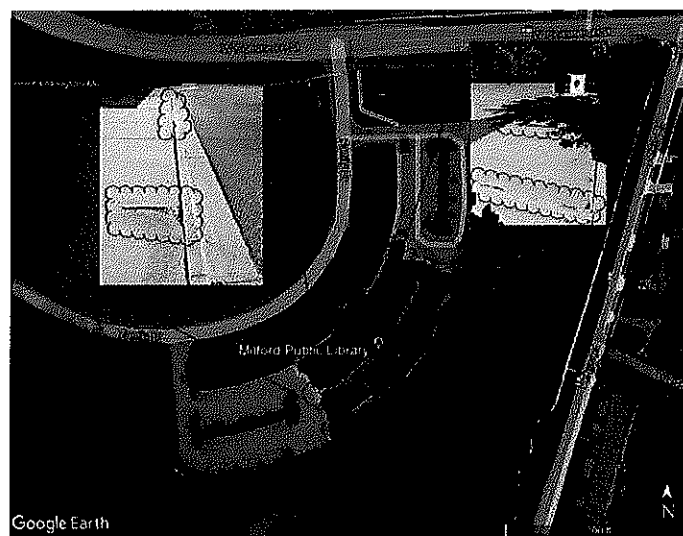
Additional Spalling at Locations of 2015 Repairs
